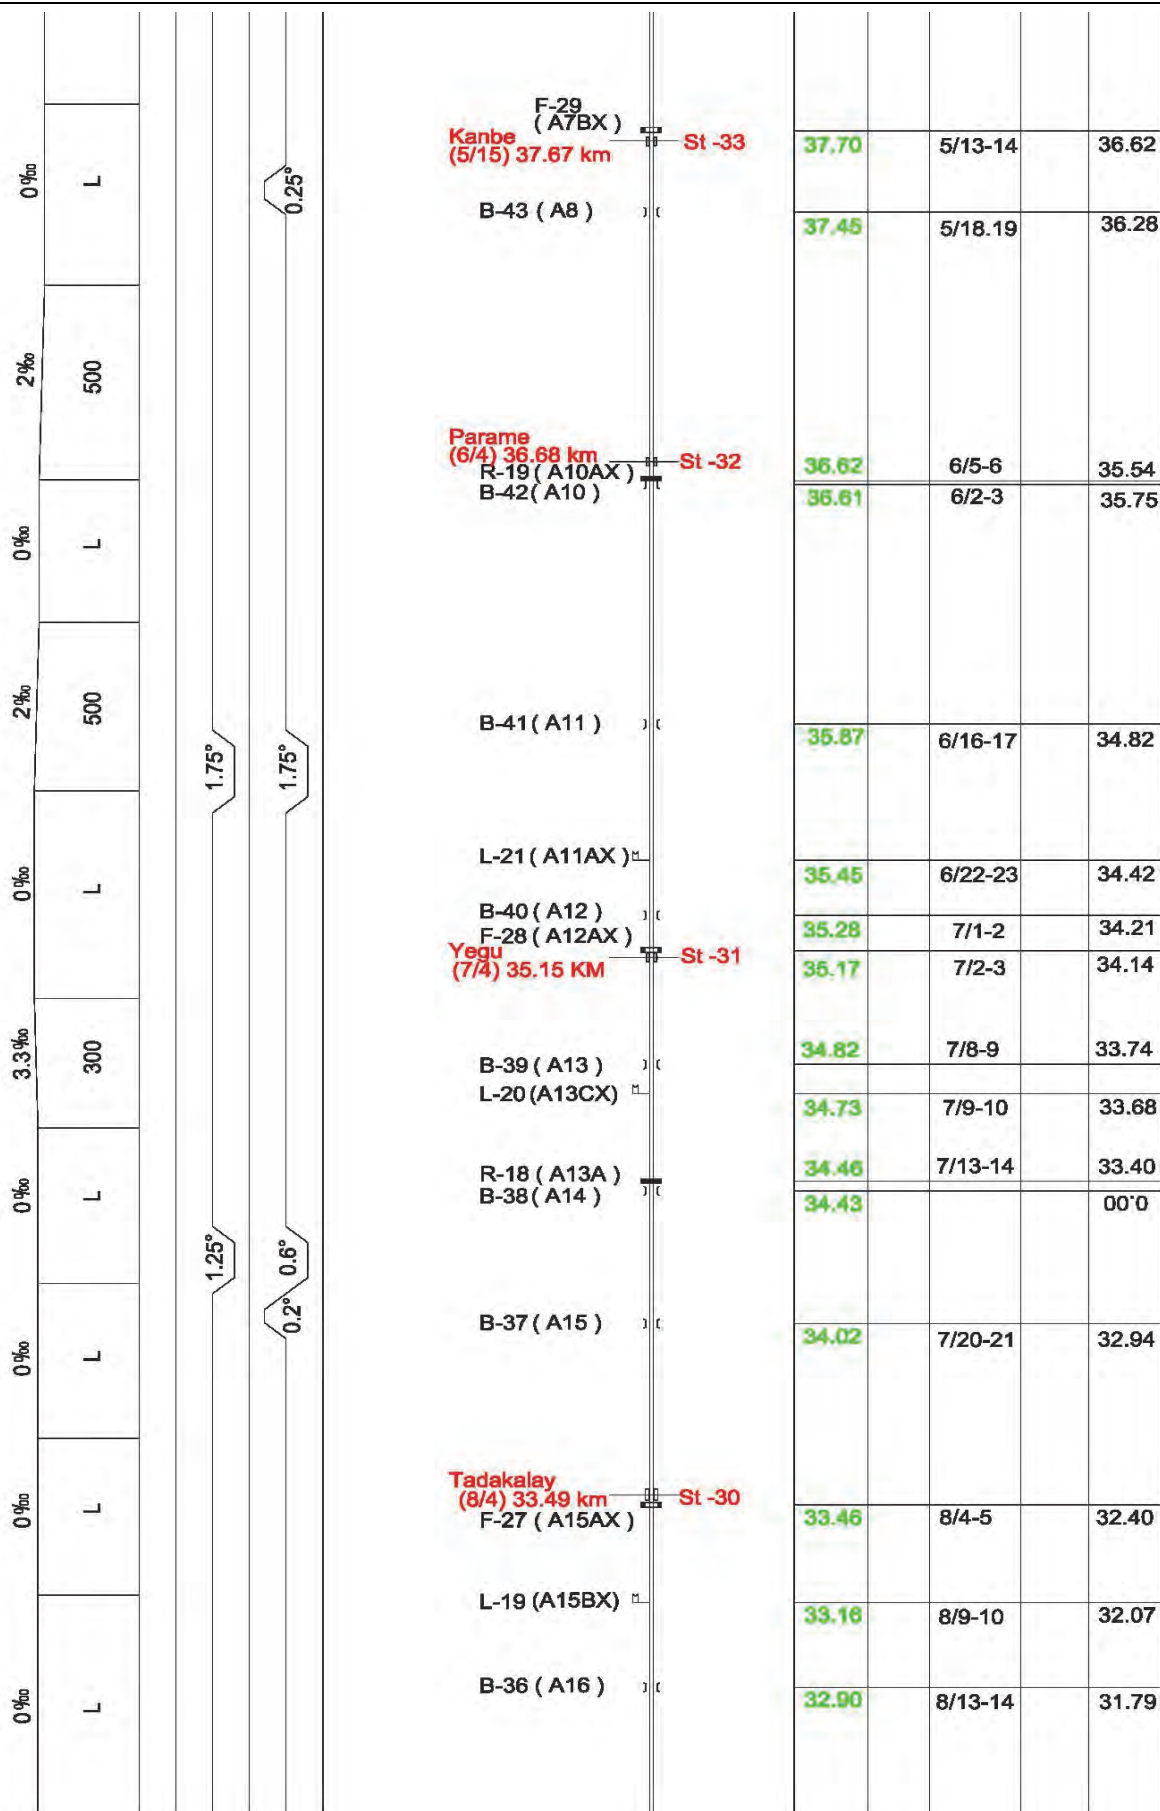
Schematic Sketch on Existing Yangon Circular Railway (7/9)
